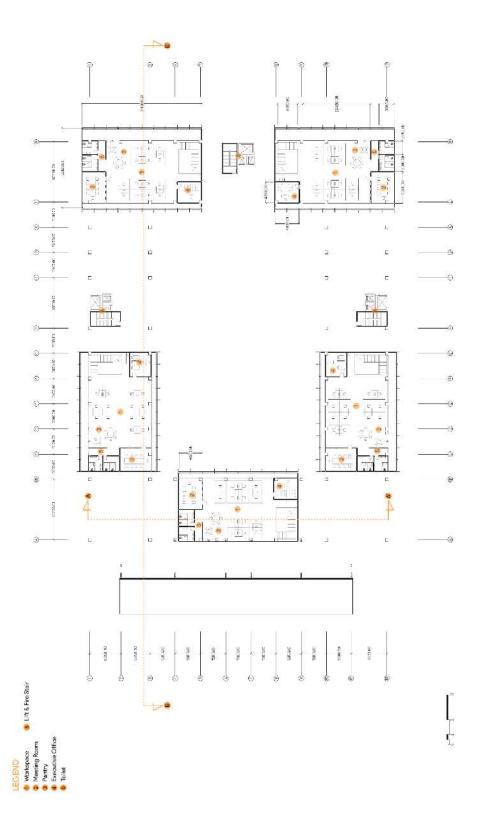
5th Floor Plan (Source: Personal Illustration)
